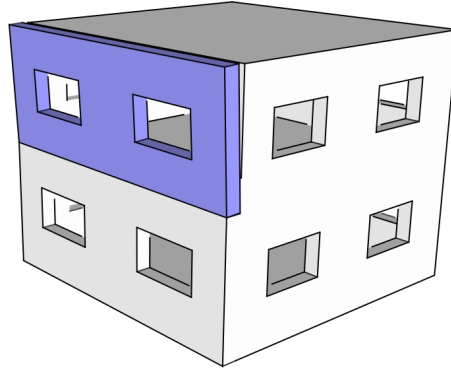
Simple overturning of one floor in a buildings with more floors
